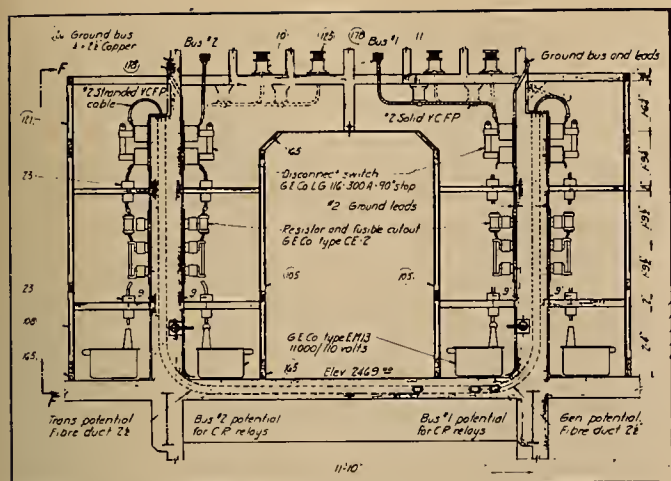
Transverse section through typical instrument transformer cell on 11-kv. bus floor.
